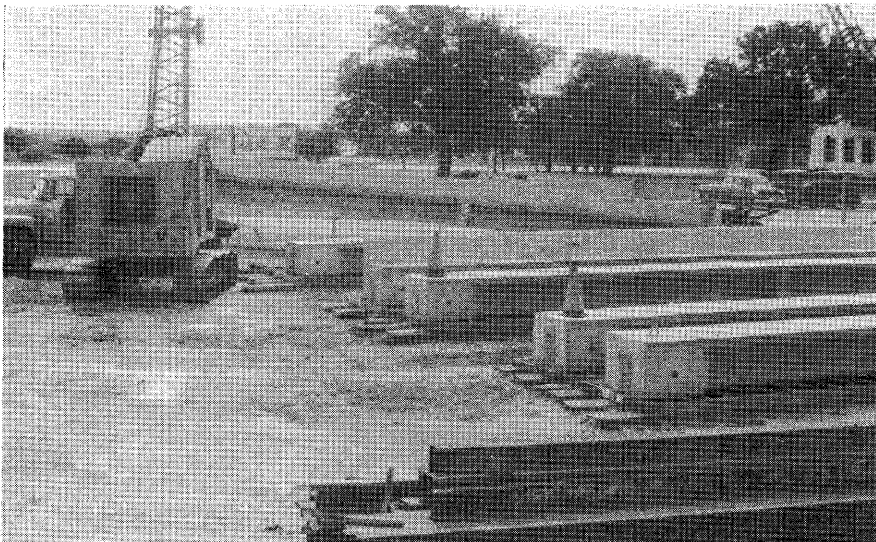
Beams were precast, prestressed and stockpiled in district yard. Exterior "curb" beam of lightweight concrete is being loaded on truck for 14 mile haul to bridge site.
